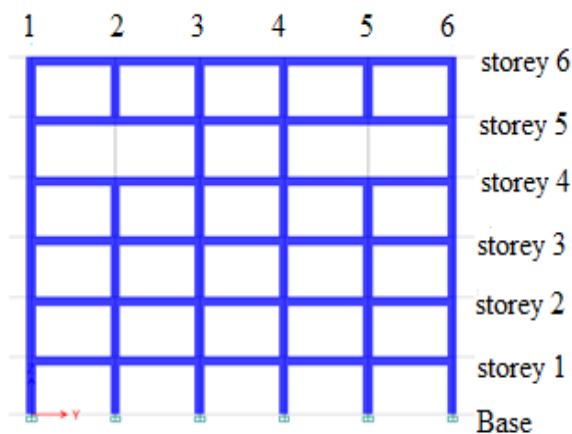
9 Section view of buildings with floating column at parallel position, 3rd floor
